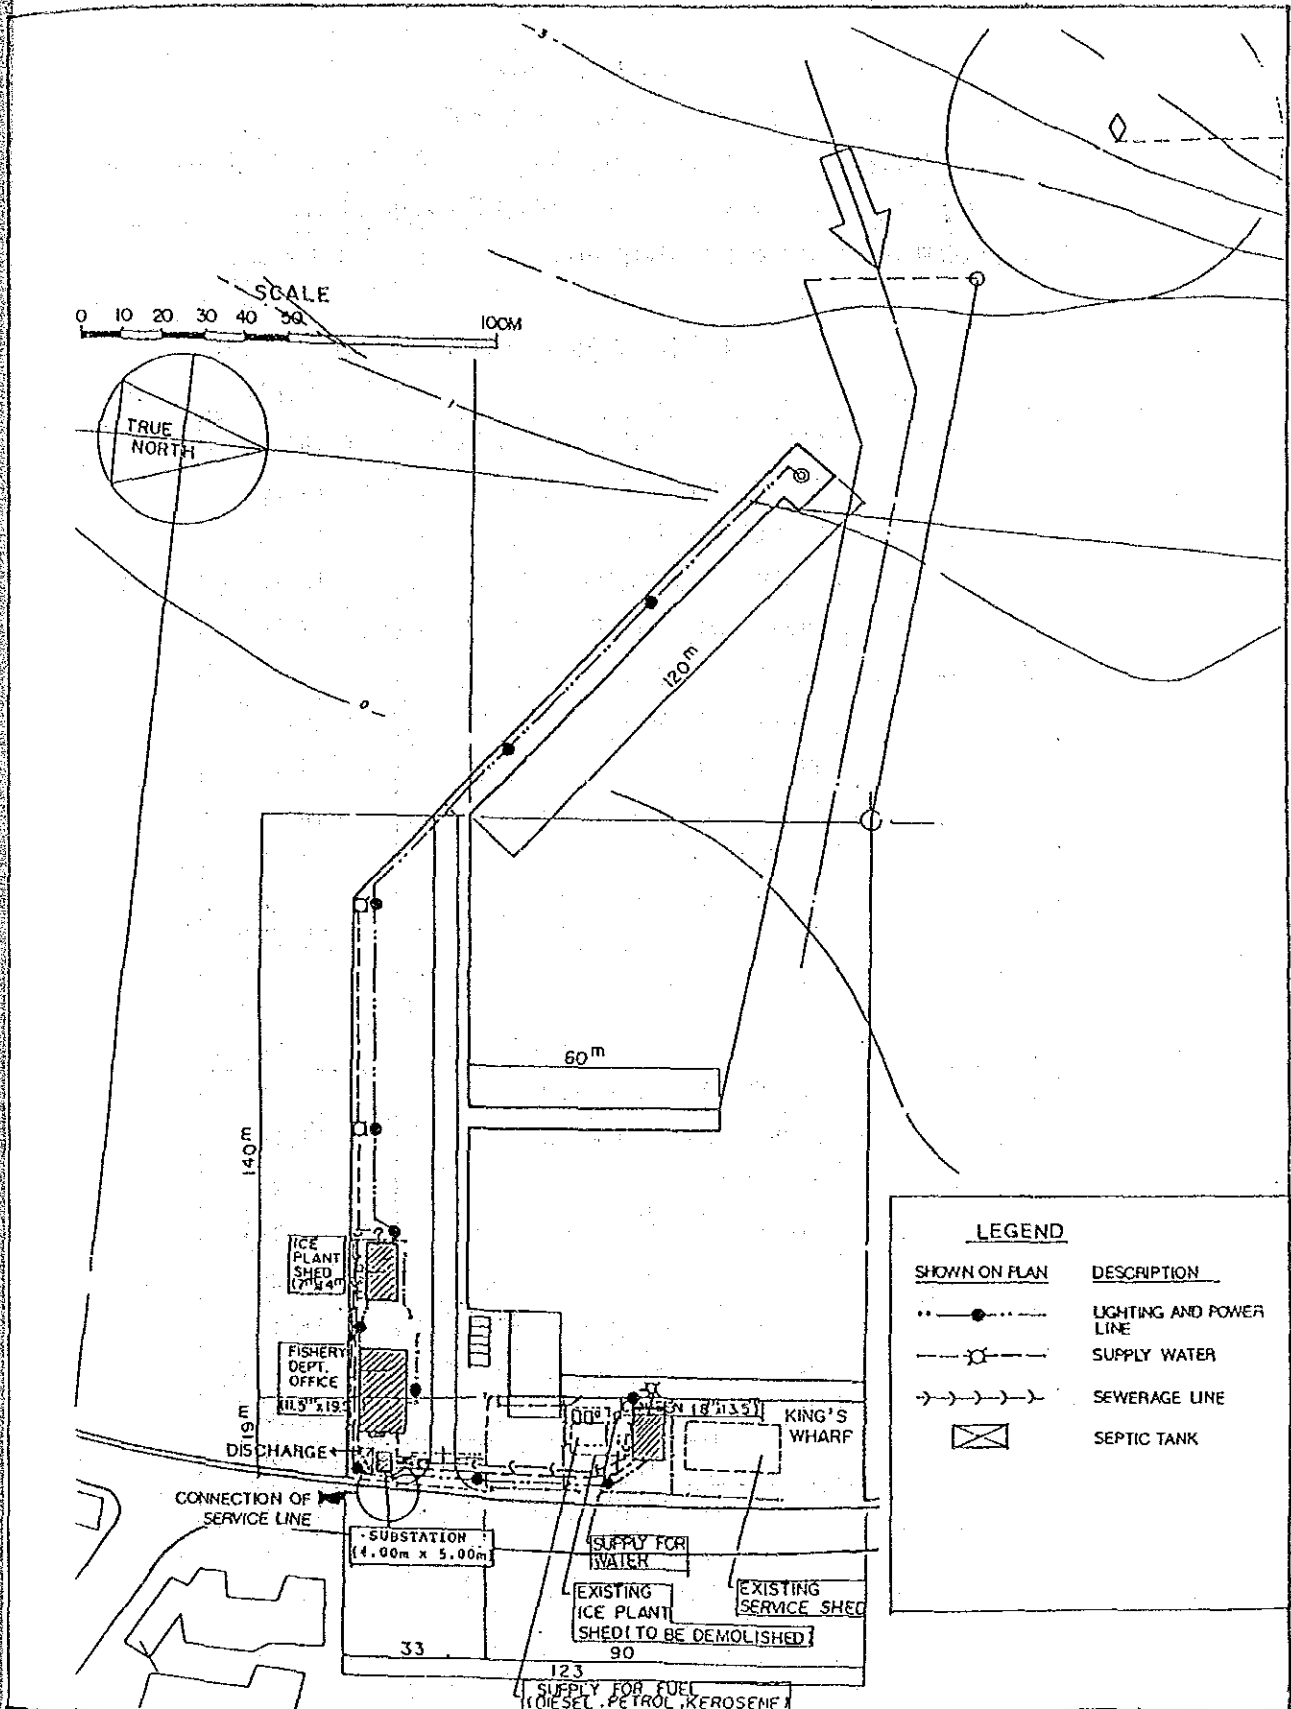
LAYOUT OF BUILDING AND OFFICE.
